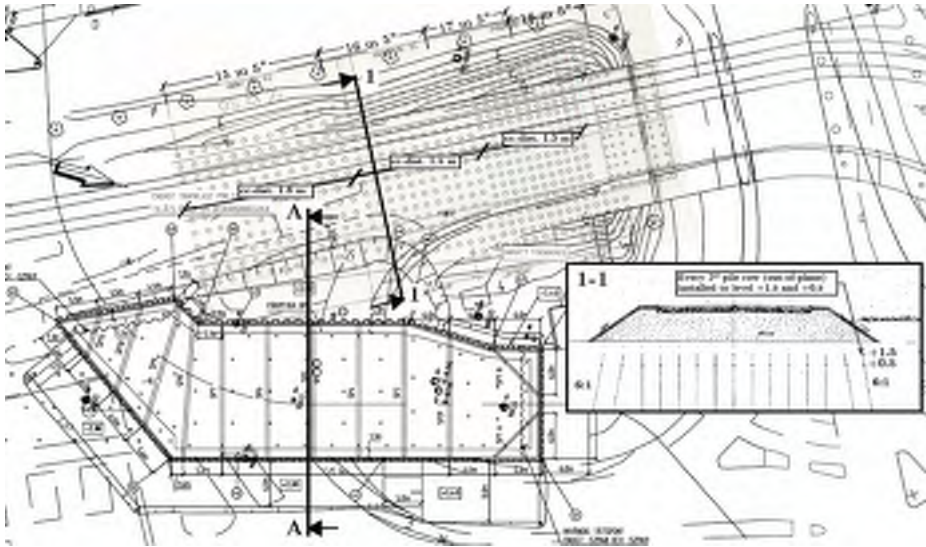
Plan of excavation and permanent structure in relation to wooden piles under the existing bridge ramp/embankment. For section A-A, refer to Fig. 4.4.
